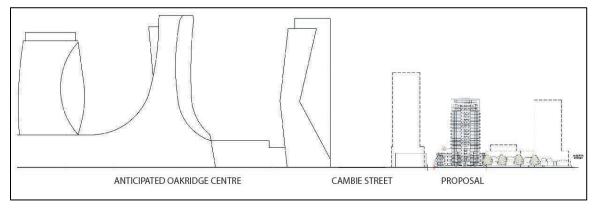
Illustrative Streetscape Anticipated Along West 42nd Avenue (North Side)
